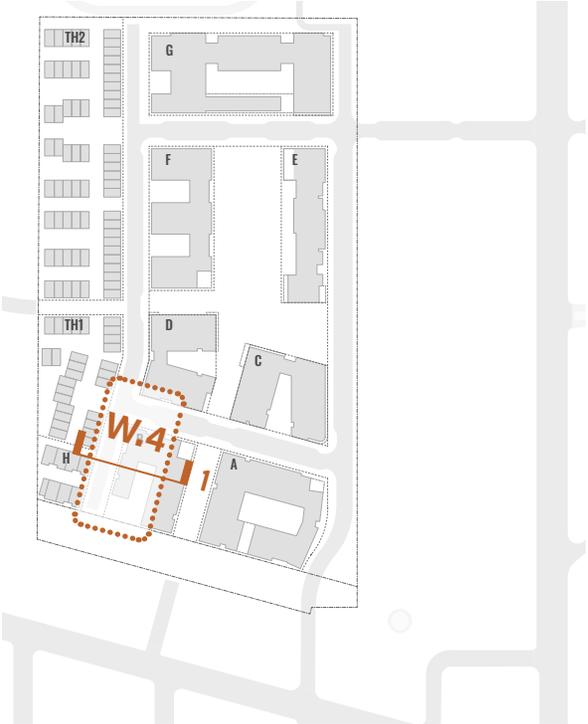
West Street North, Section 1 *see "Figure 5.15.2: West Street North, Plan Enlargement", Site Plan W.1
